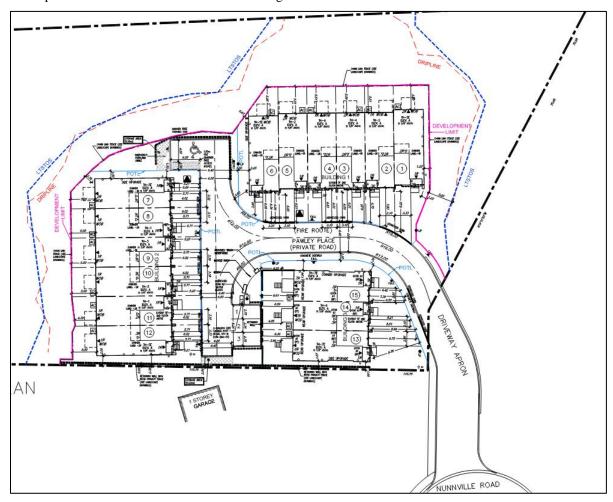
Proposed Site Plan (Prepared by VA3 Design, dated March 2023)
